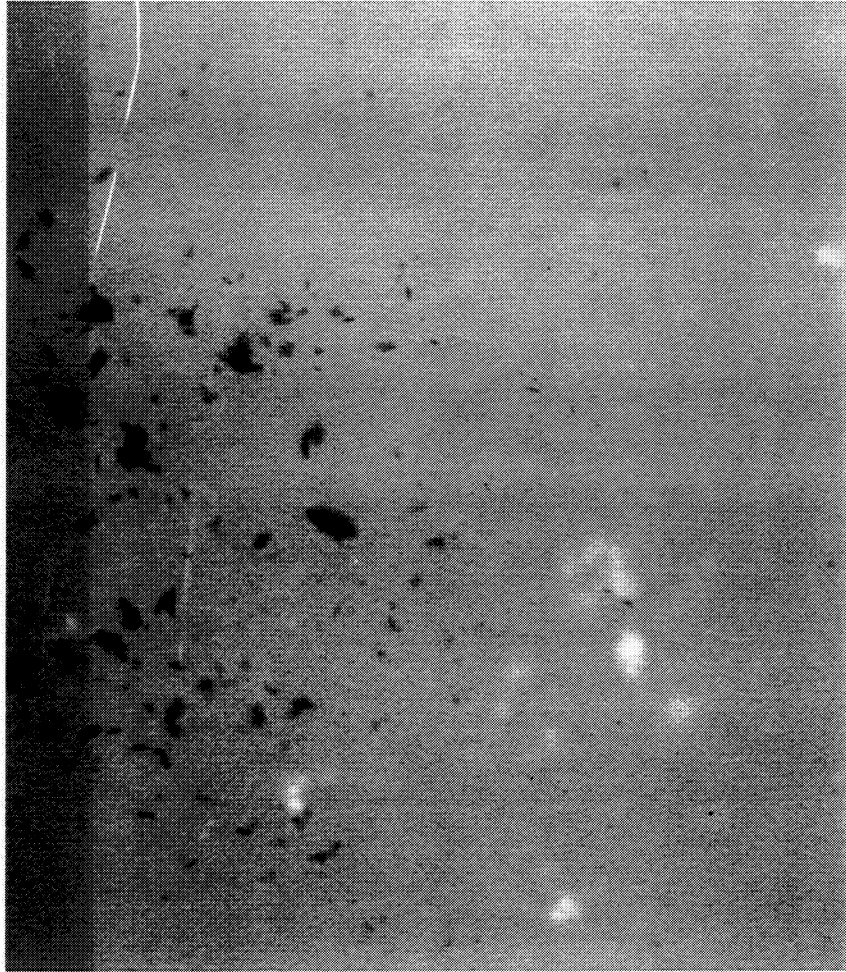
Behind Wall Debris Pattern for Test 7698-11
